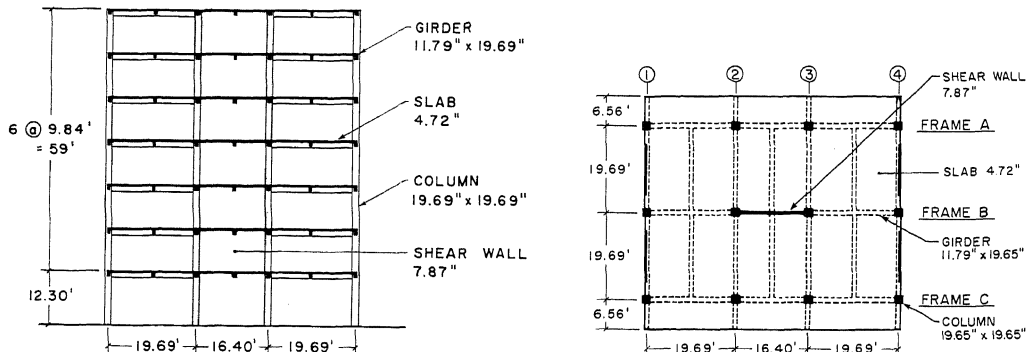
PLAN & ELEVATION OF PROTOTYPE STRUCTURE
